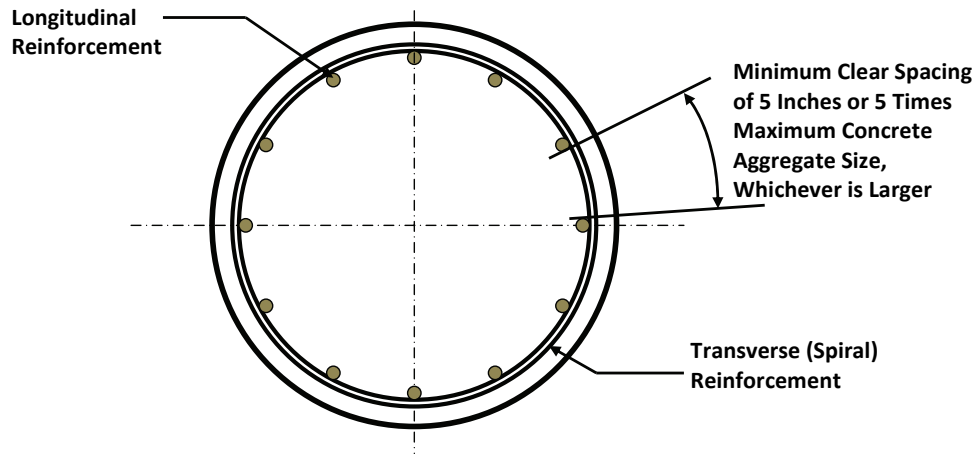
Transverse (Confinement) Reinforcement Details (AASHTO Figure C5.10.11.4.1d-1)
